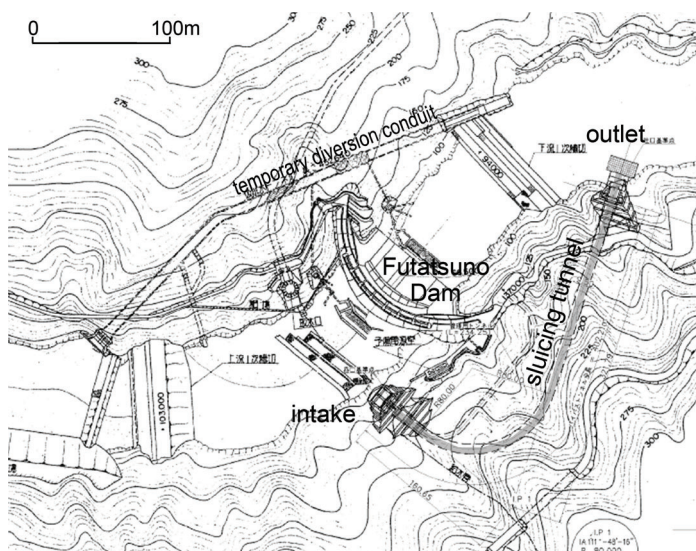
Layout of sluicing tunnel at Futatsuno (in ground plan)
